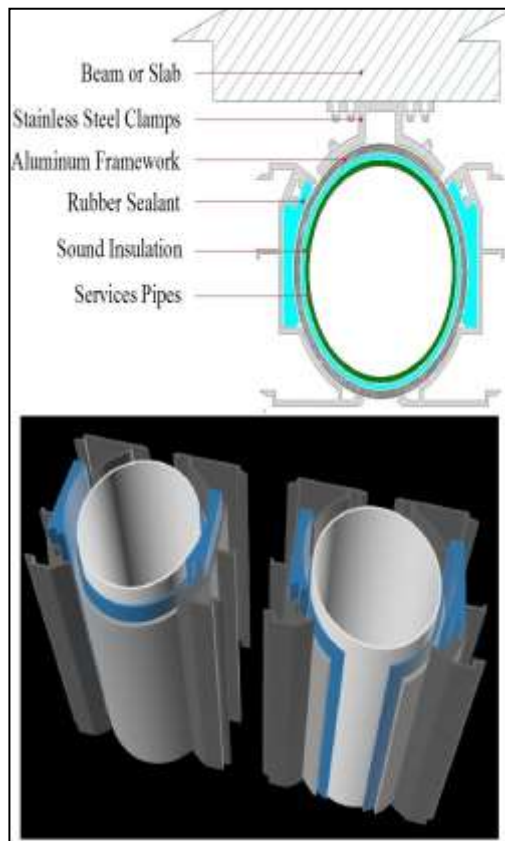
Sample –A- Curtain walls profile with rainwater drain
